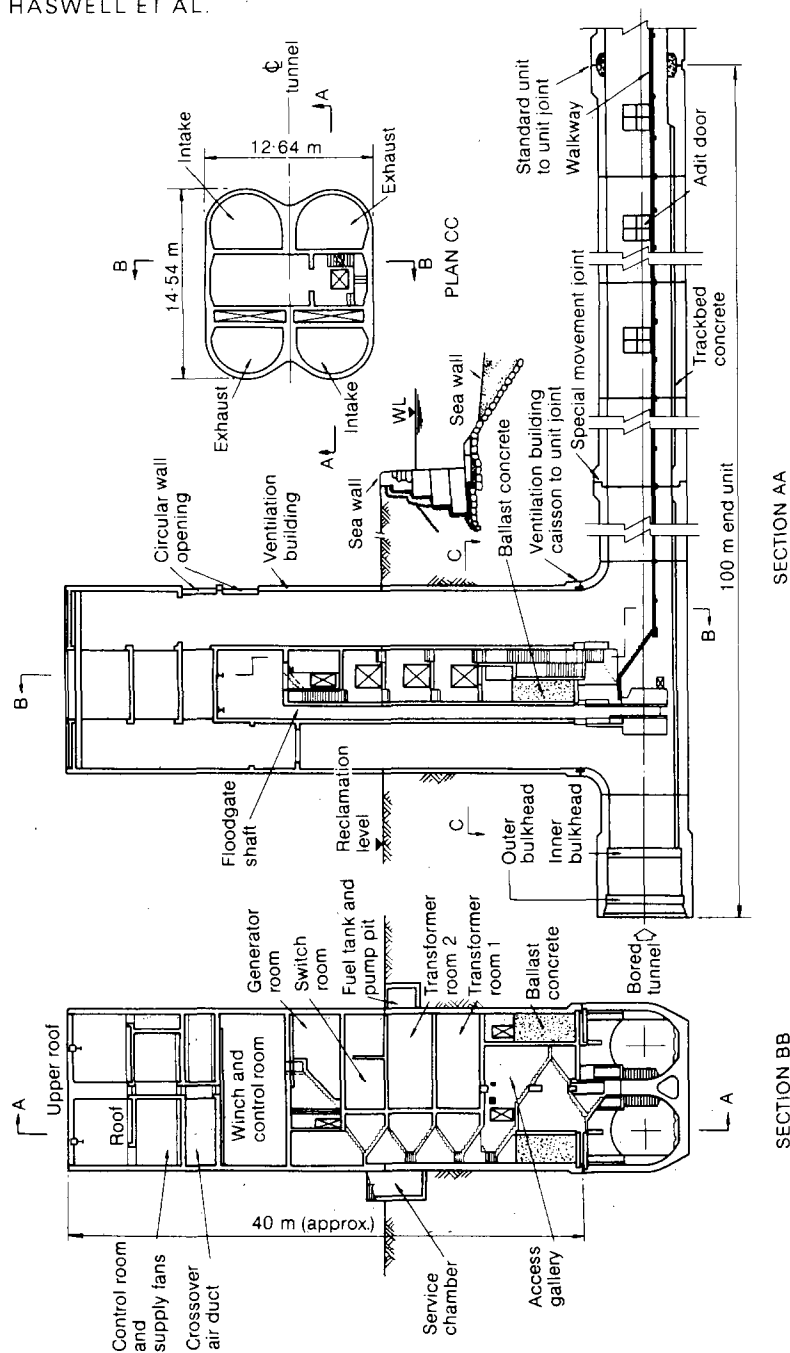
Immersed tube tunnel: end unit and ventilation building
